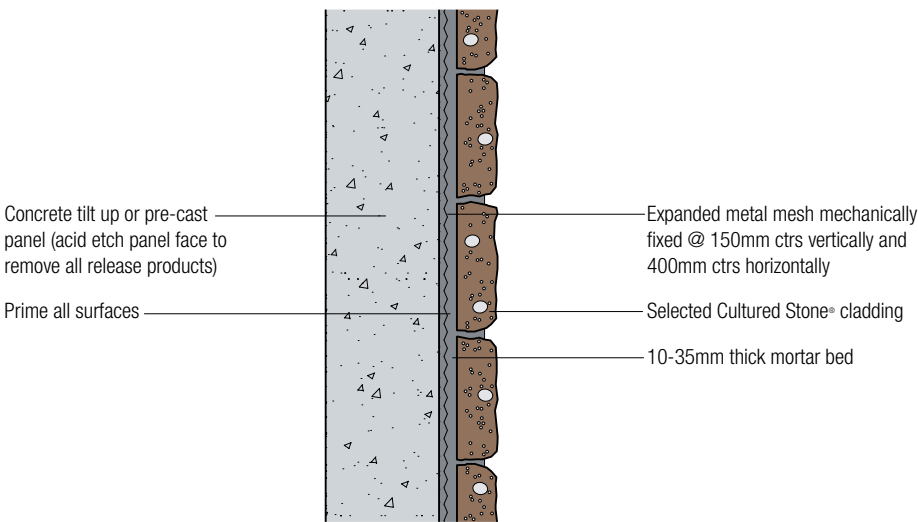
Concrete Tilt Up or Precast Panel - Section (Dwg # CS-05.04)
